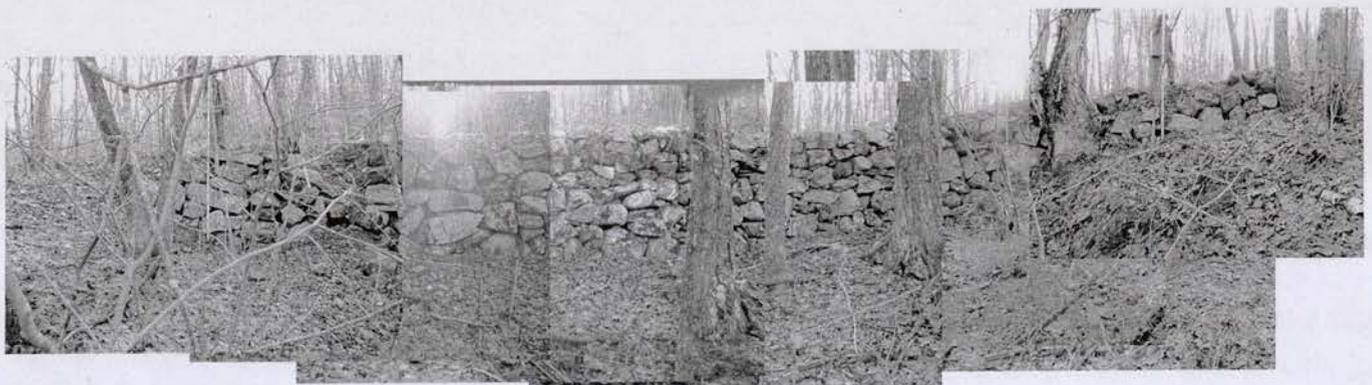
25-12-1-2005 London Bridge W wall overview View NE
